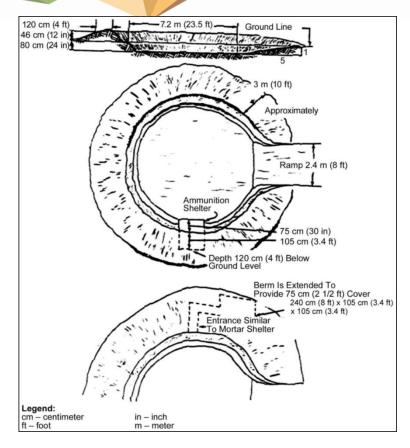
Towed howitzer emplacement (105-millimeter and 155-millimeter howitzer) layout
